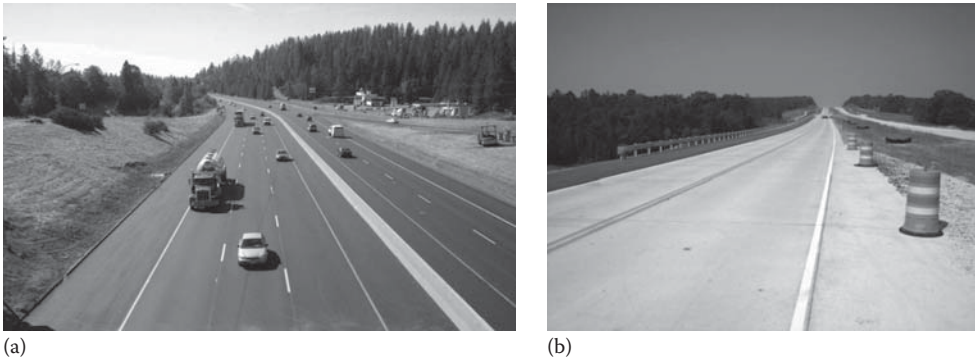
(a) Example of asphalt pavement. (Courtesy of Mike Marshall, Wirtgen, GmbH, Windhagen, Germany.) (b) Example of concrete pavement. (Courtesy of Wouter Gulden, ACPA, SE Chapter, Duluth, GA.)
